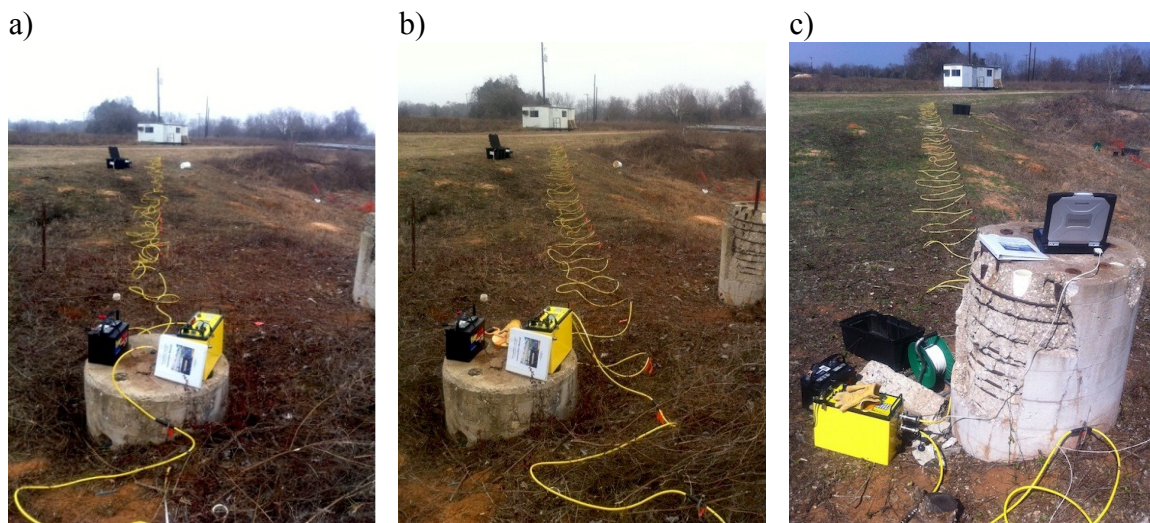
View of profiles TS4A (a) and TS4B (b) carried out parallel to drilled shaft TS4 and profiles RS5A (c) carried out over drilled shaft RS5.
